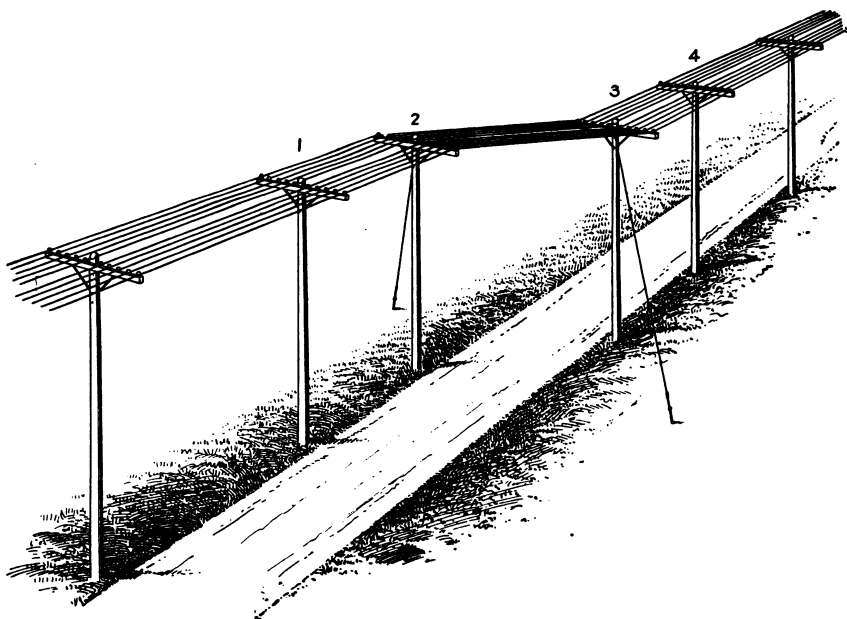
AERIAL LINE CONSTRUCTION, GUYING AT ROAD CROSSING.
